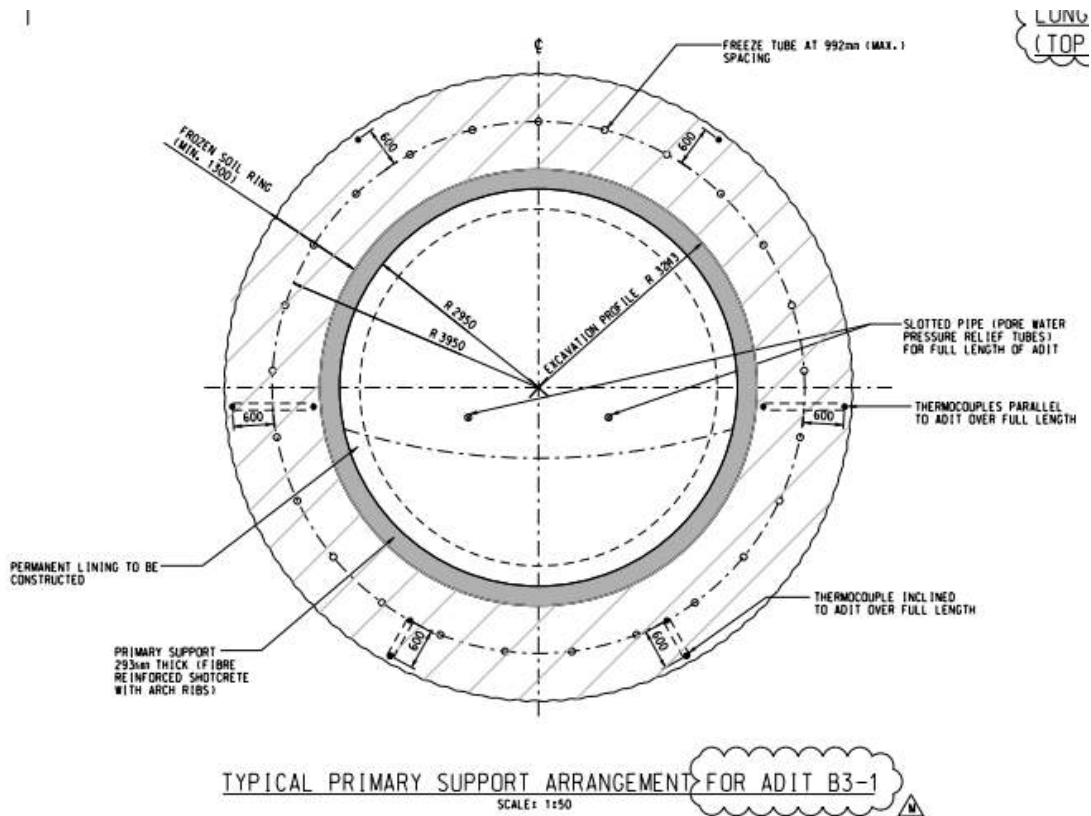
Typical temporary support arrangement from SYP Adit B3-1
